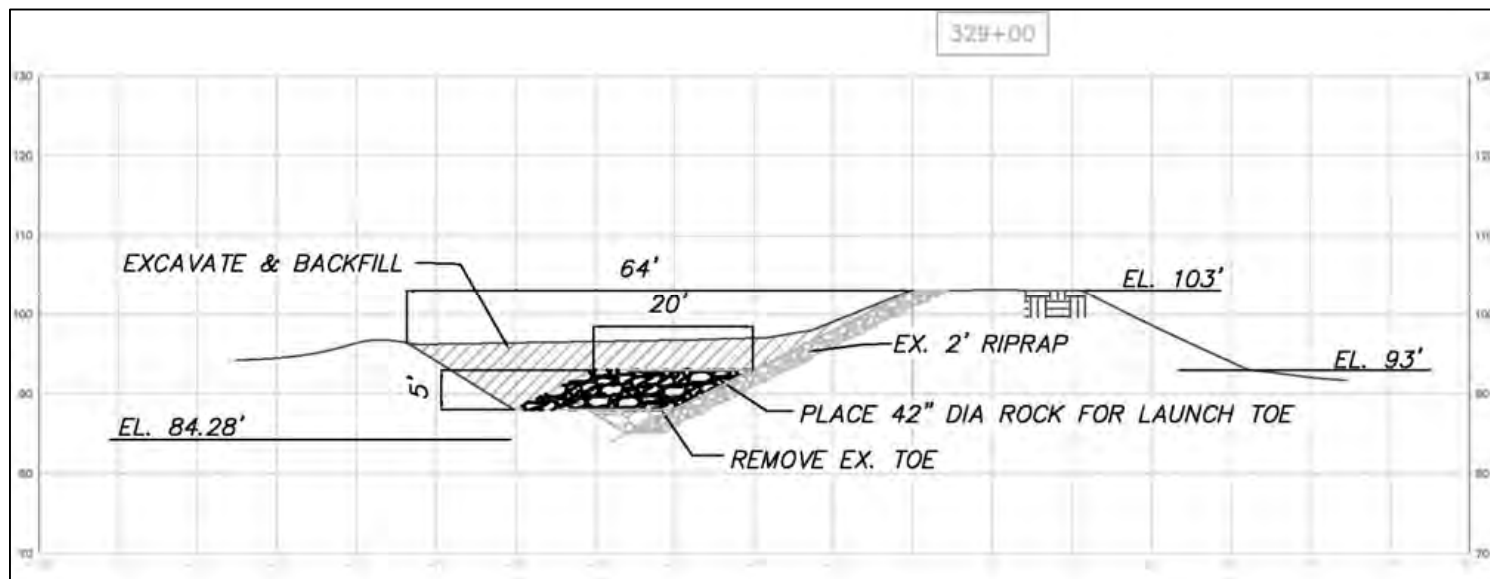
Typical Cross Section of Measure 11, Failure Reach 1
